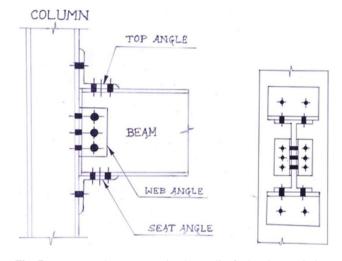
Beam to column connection by Hadianfard and Razani [37]
